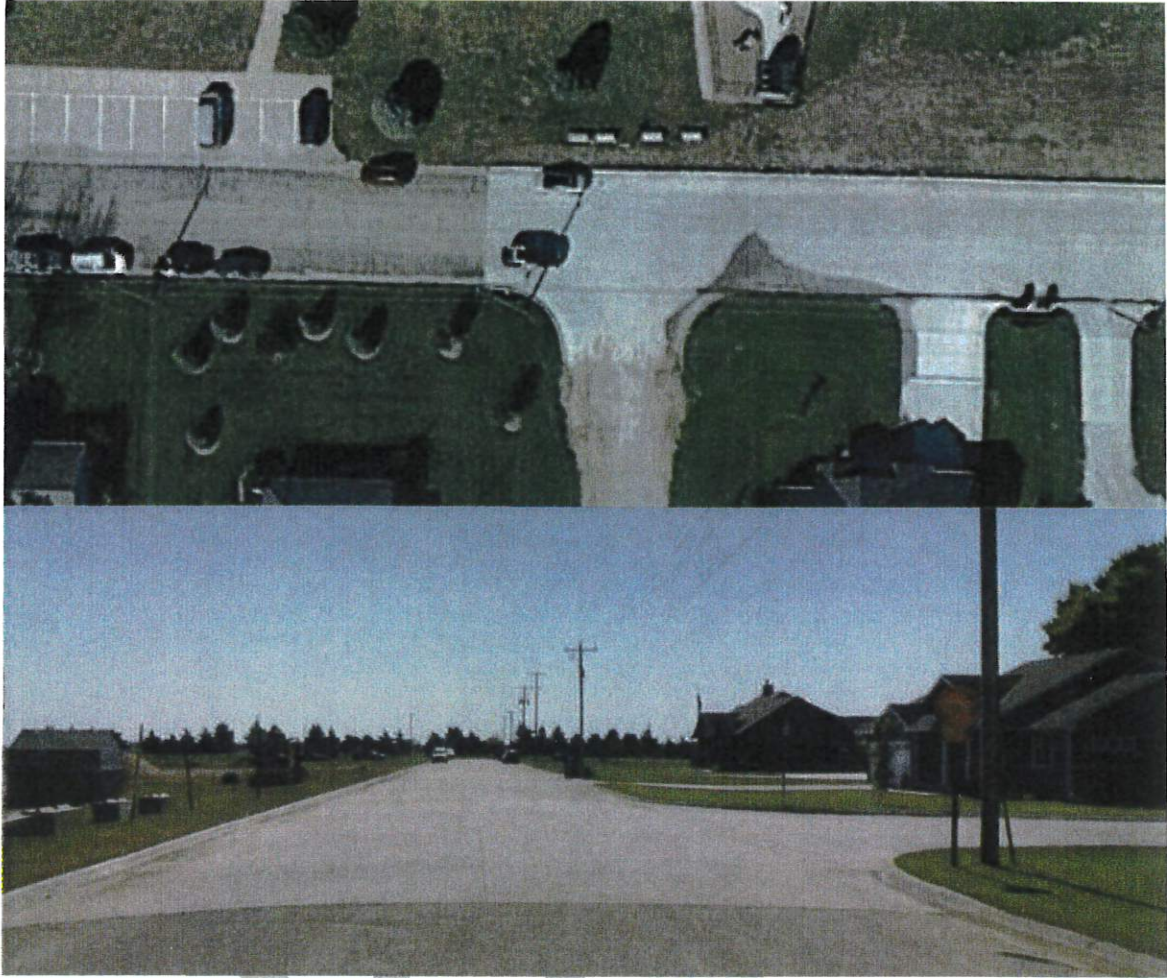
Intersection of 18th Street and H Street (Overhead and Looking East)
